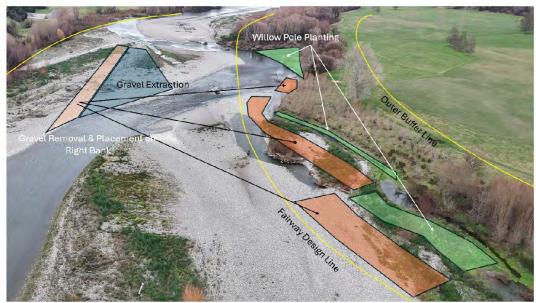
Ruamāhanga bed recontouring plan at Te Whiti
